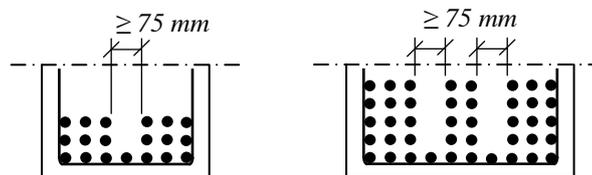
Arrangement of reinforcement with respect to satisfactory placing and compaction of concrete according to *Barker (1967)*.
